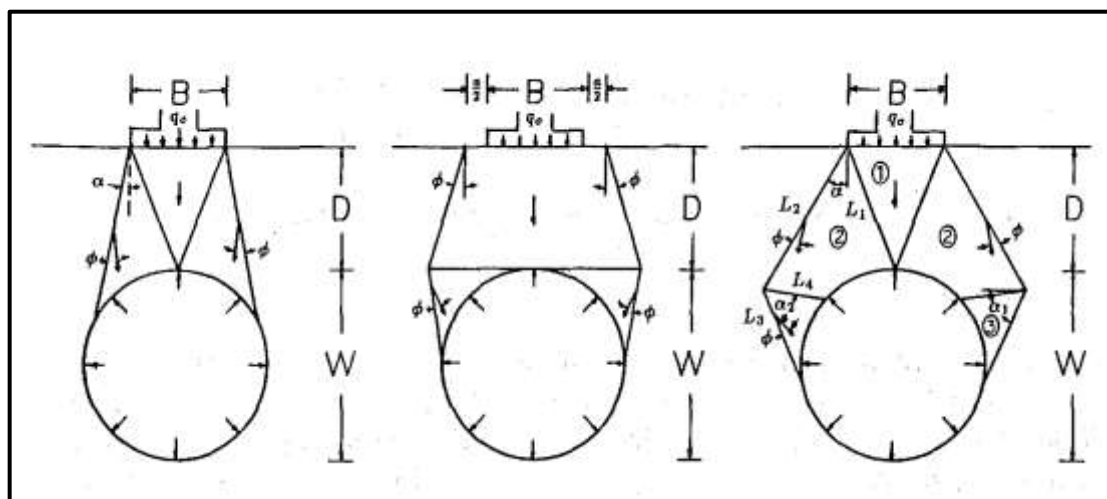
Failure mechanism of footing collapse<sup>[2]</sup>
